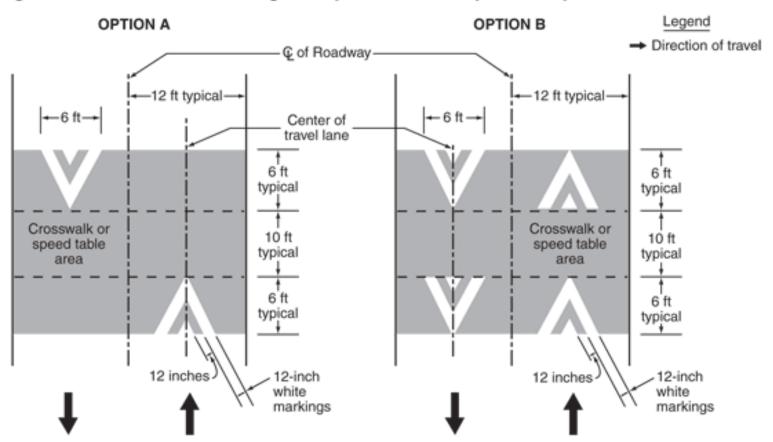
Raised Crosswalk at Intersection (Source: City of Cambridge, Massachusetts)
